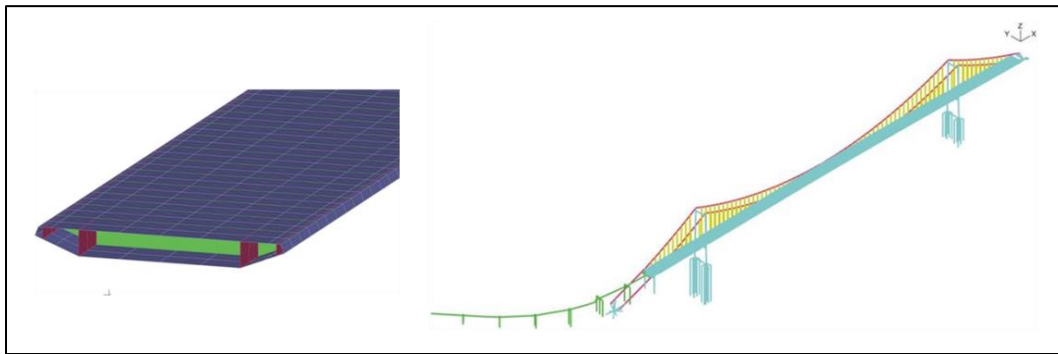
Detailed FE Model of the New Carquinez Bridge (Alfred Zampa Memorial Bridge)
